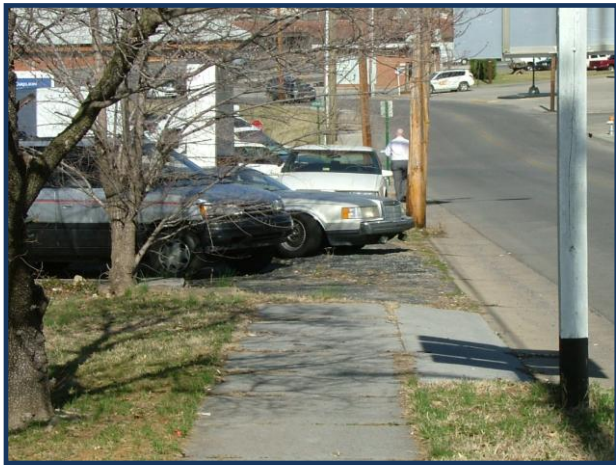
Pedestrians are forced to walk in the gutter along South Pollard Street which needs significant improvements.
